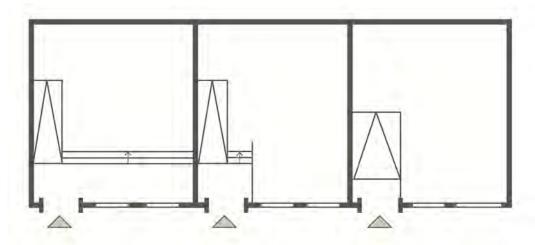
Examples of design options that provide street activation and raised internal ground floors in a flood
